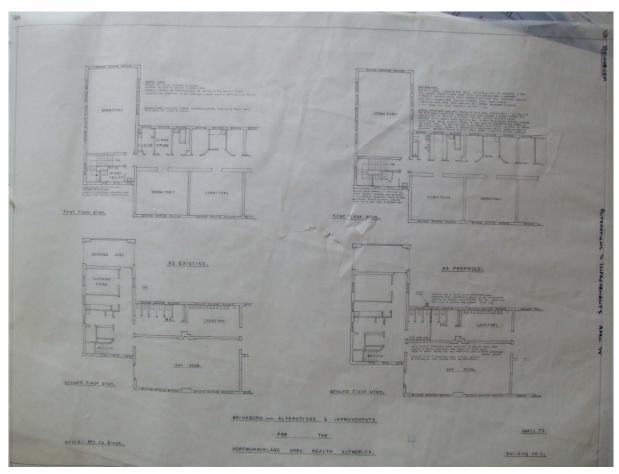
Historic plan of alterations to Building 17, Brinkburn Villa
